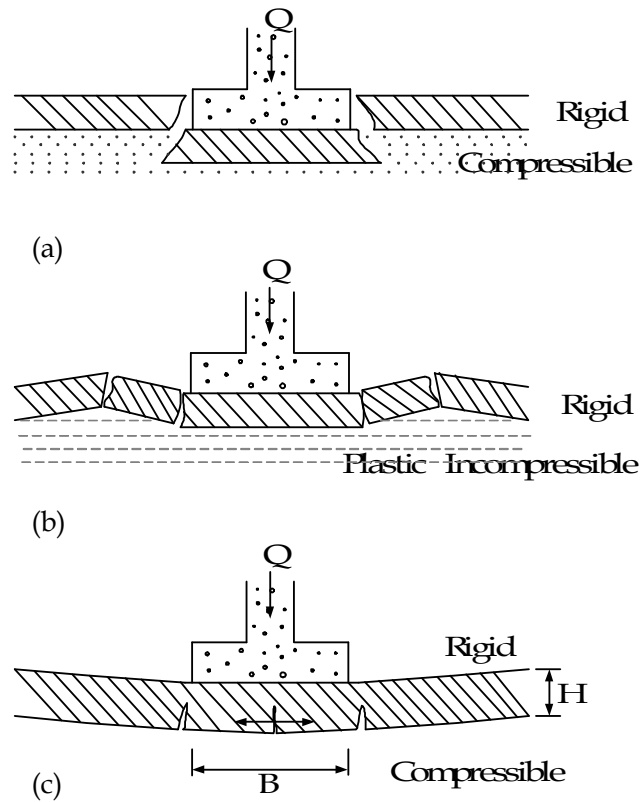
Spread footings on layered rock formations with rigid upper layer and weaker lower layer and weaker lower layer: (a) punching failure; (b) buckling failure; and (c) bending failure.
